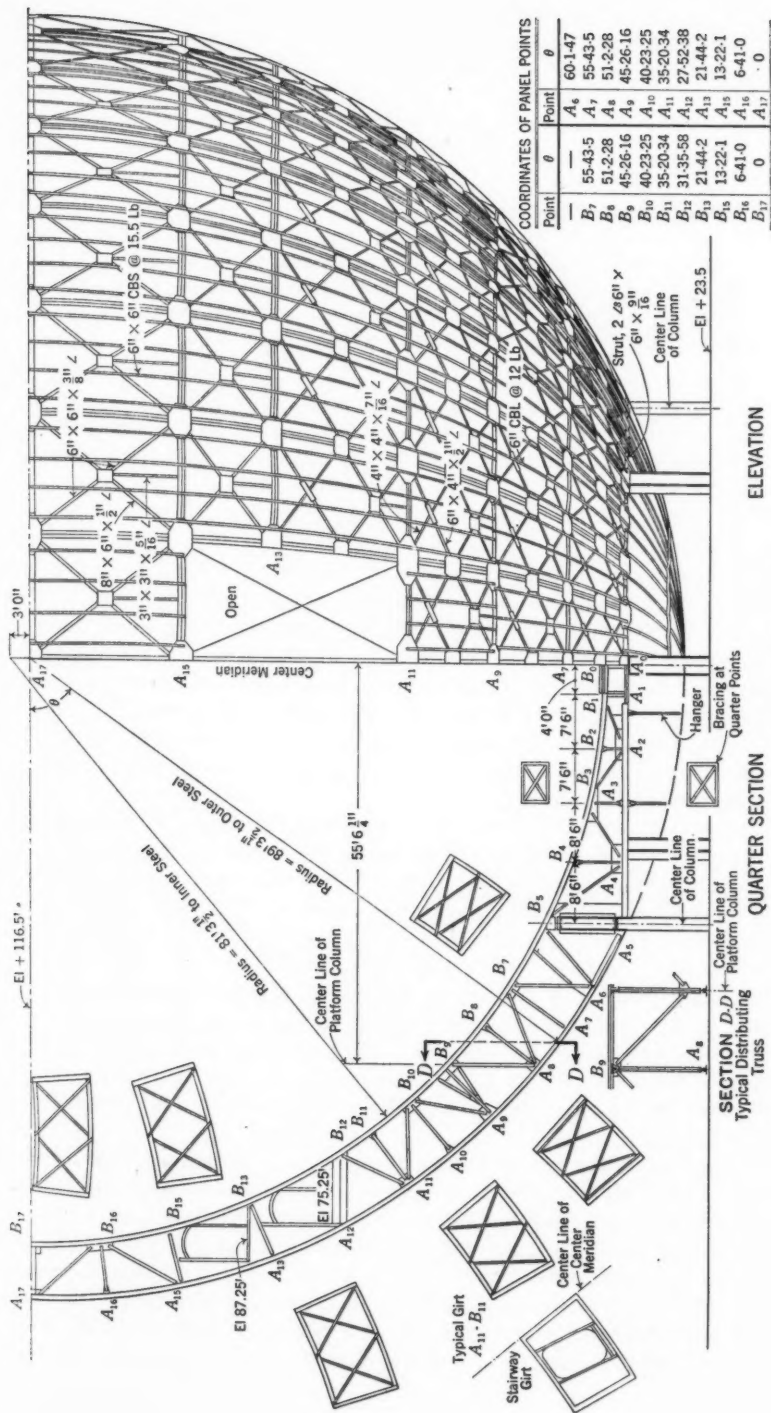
STEEL SKELETON OF PIERSPHERE
